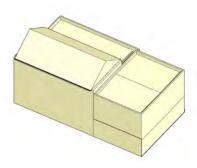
Basic massing, articulation, and opening strategies should relate to each other and break down the scale of the buildings.
